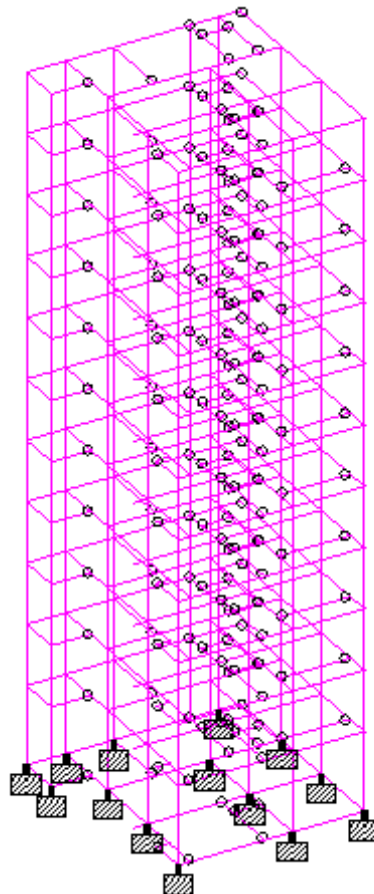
STAAD Model of Residential Building (without diaphragm) in isometric view
